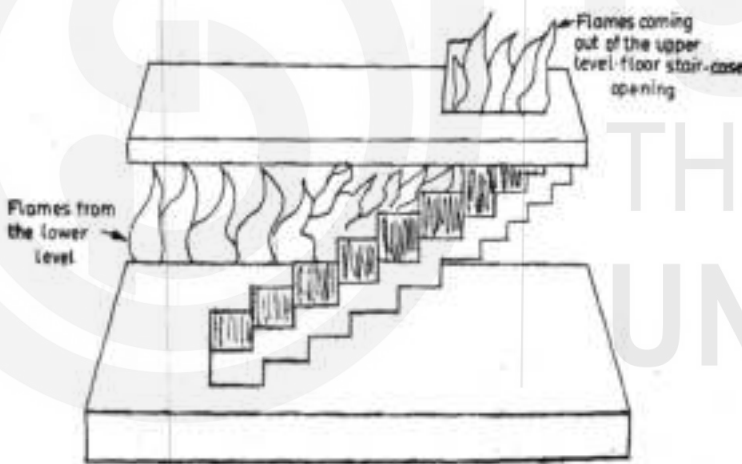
Fire Spreading to the Upper Level Unprotected Staircase Openings
